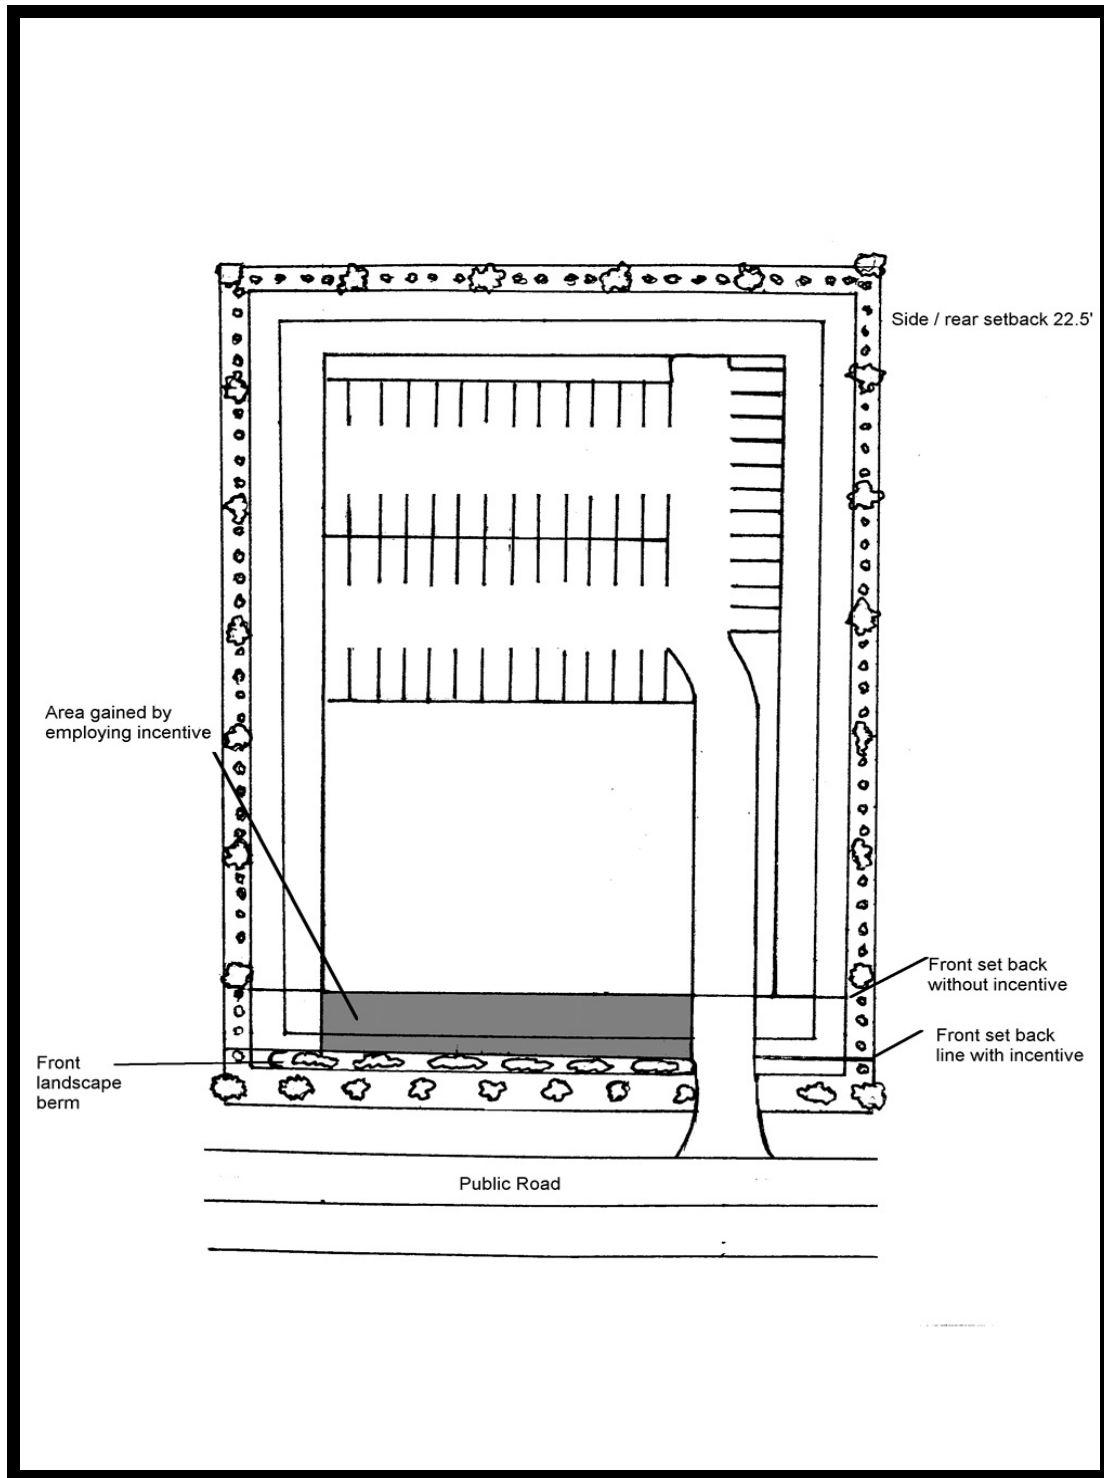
Example site plan with reduction of front setback by employing incentive to construct 8' landscaped berm
